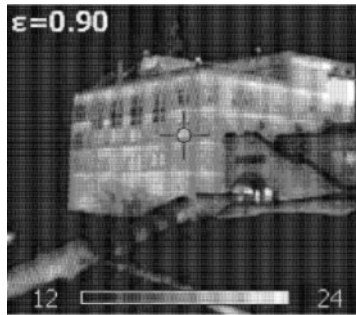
Heat loss photo of a steel-framed building (J. D’Aloisio 2009)
